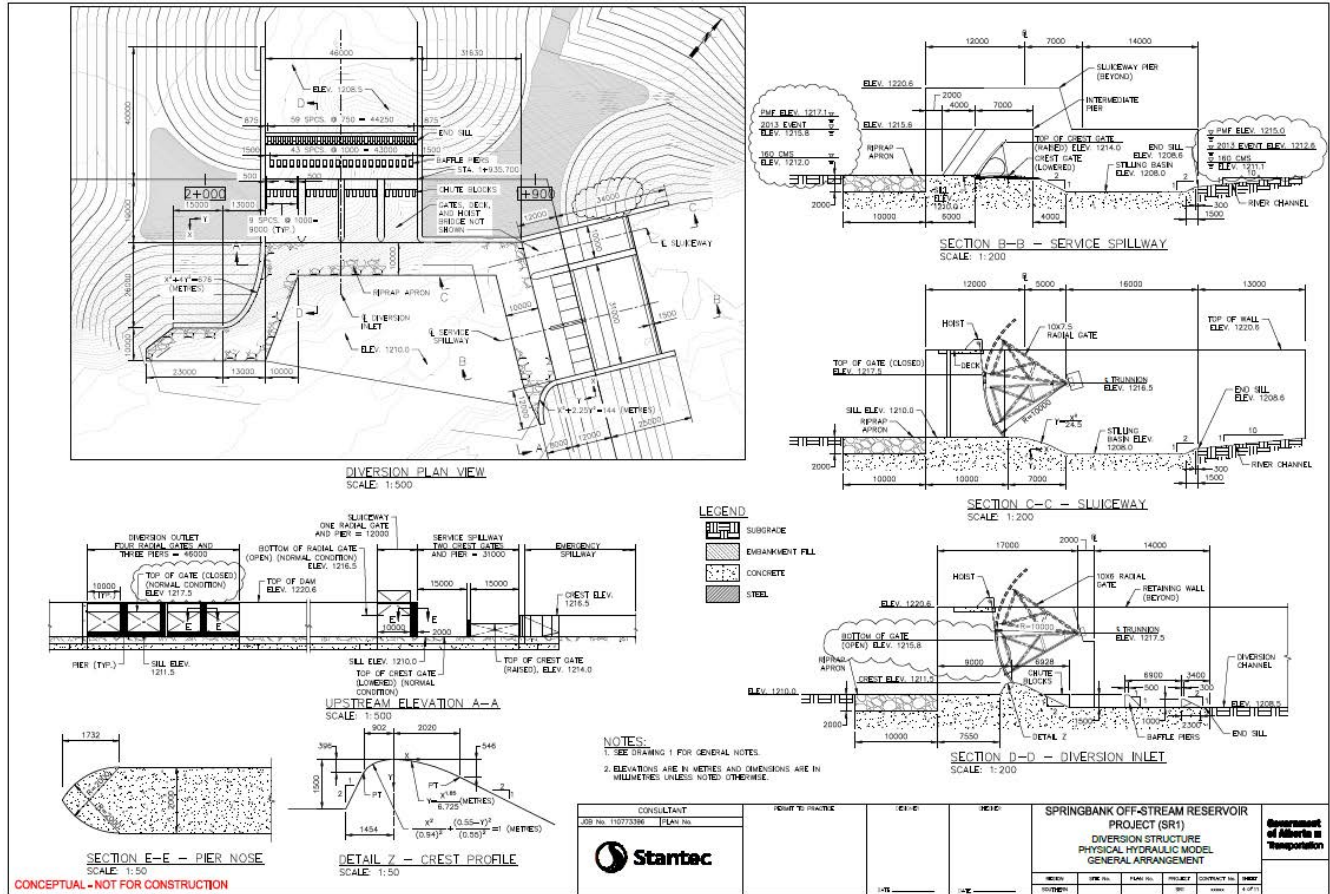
General arrangement drawing of the initial diversion inlet structure and service spillway.
